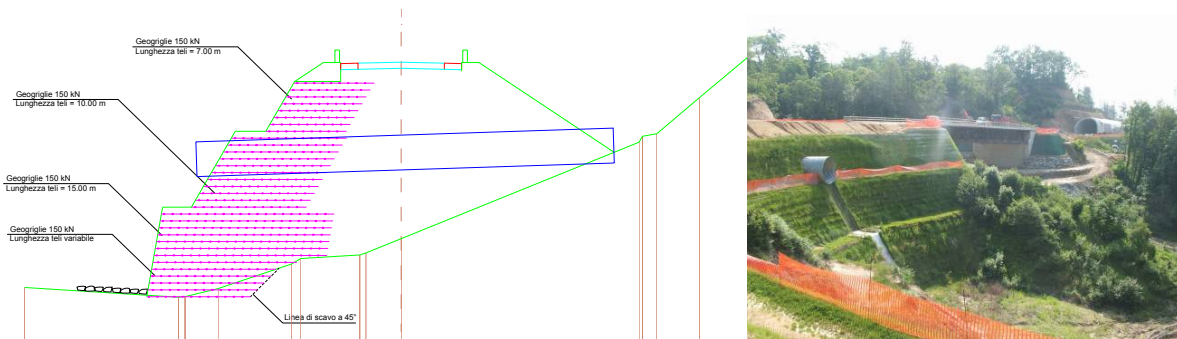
Cross-section and picture of the tallest embankment of SR232 project
